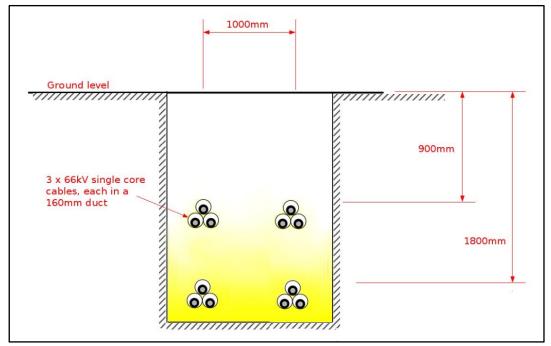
General arrangement of the proposed TEOWF cable layout for Sandwich Road
